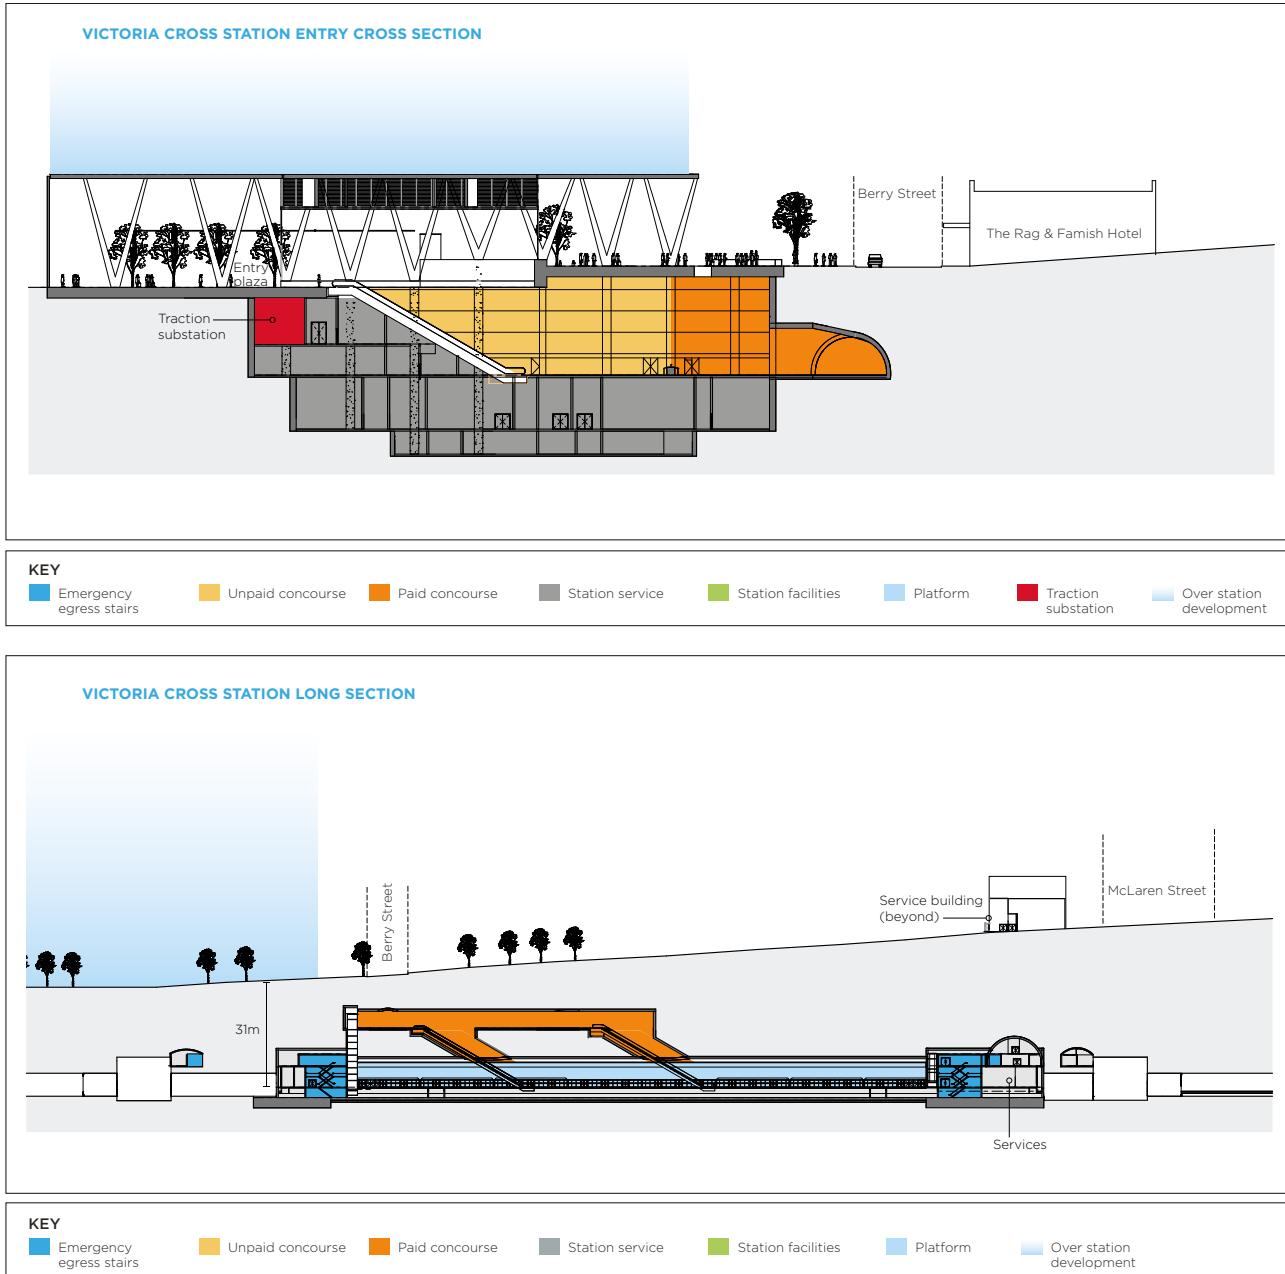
Victoria Cross Station – indicative cross-section and long section
